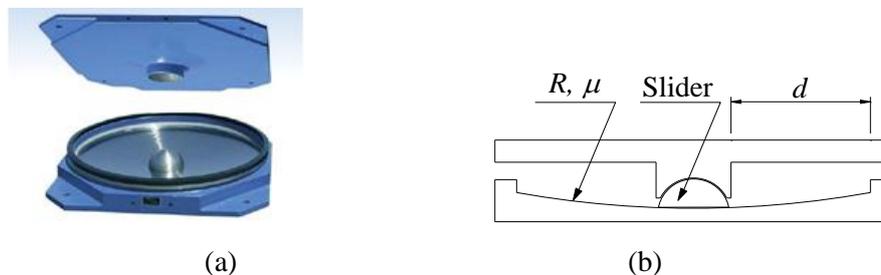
Single friction pendulum (SFP) bearing. (a) Cutaway view, (b) Cross section.
